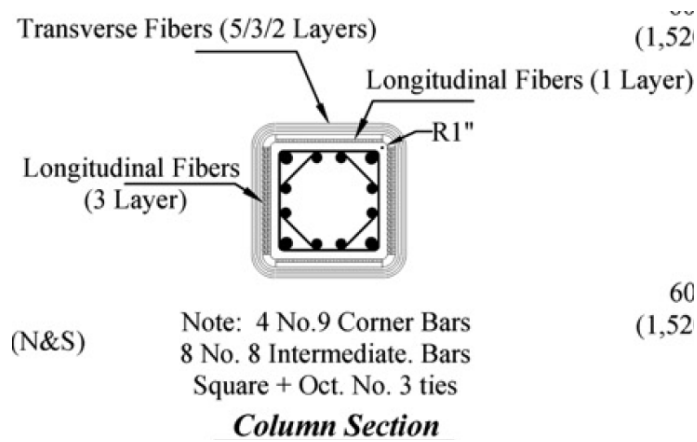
Cross Section of the Column 2-R with details of the CFRP material applied (He, 2013)
